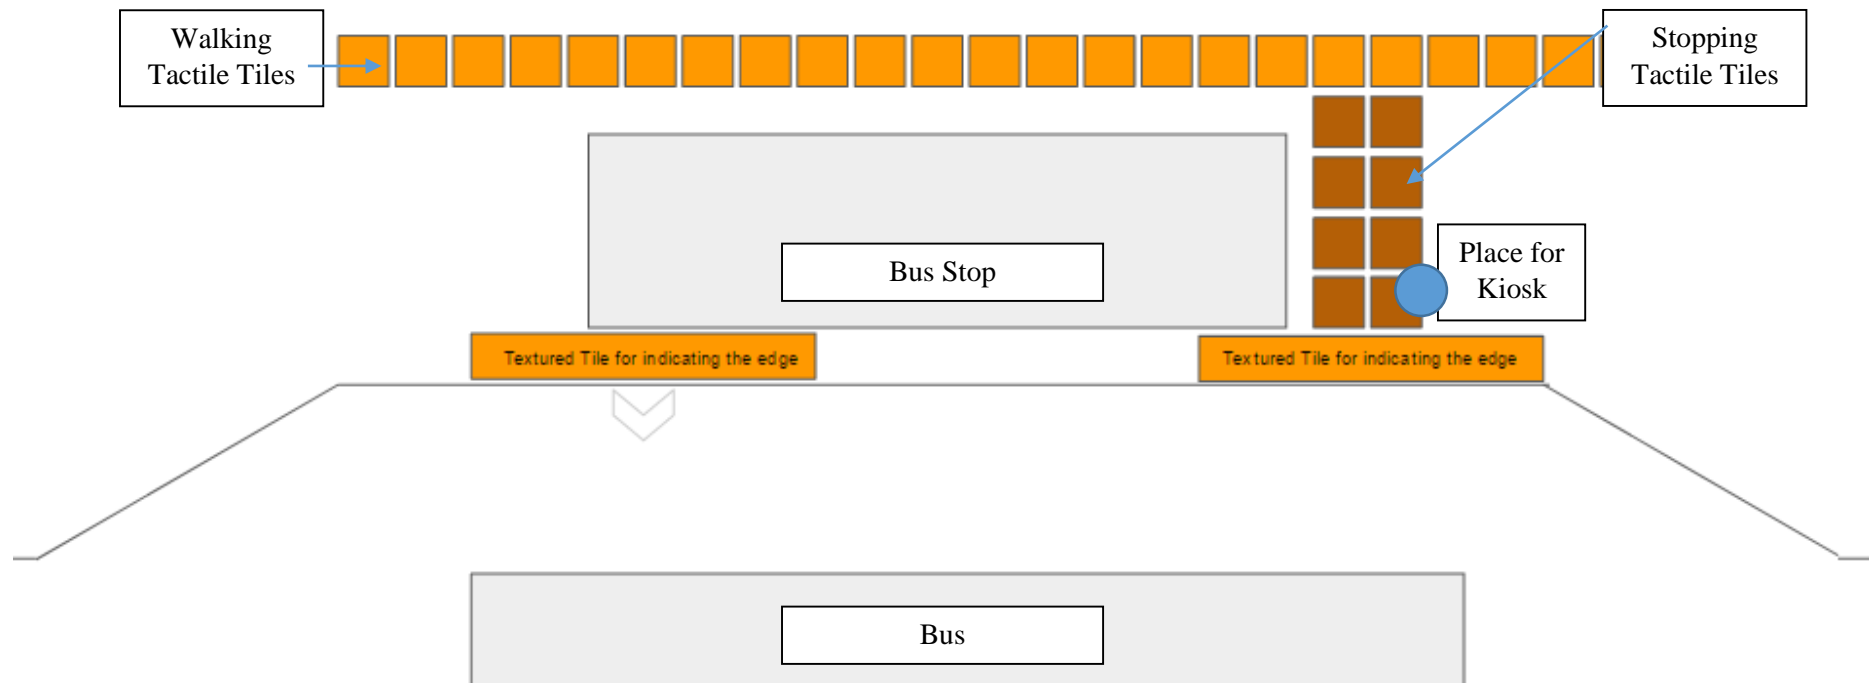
Positioning of the Kiosk and proposed Stop Layout (Source: Author)
